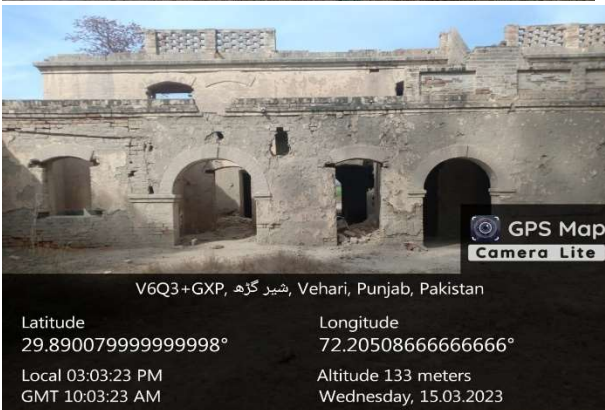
Shergardh & Mailsi Rest-house, and Mailsi-Syphon
